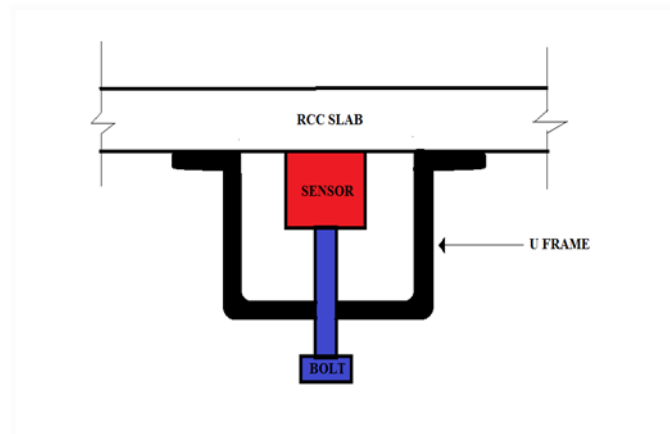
U-Shaped clamp designed for holding AE sensor
